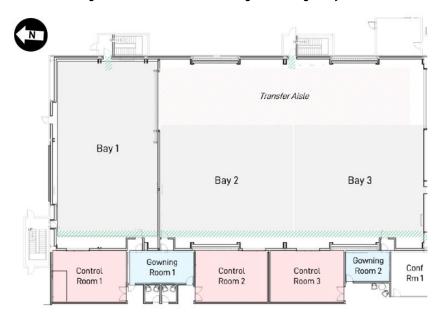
VSFB Building 398 for Non-Hypergol Payloads Floor Plan
